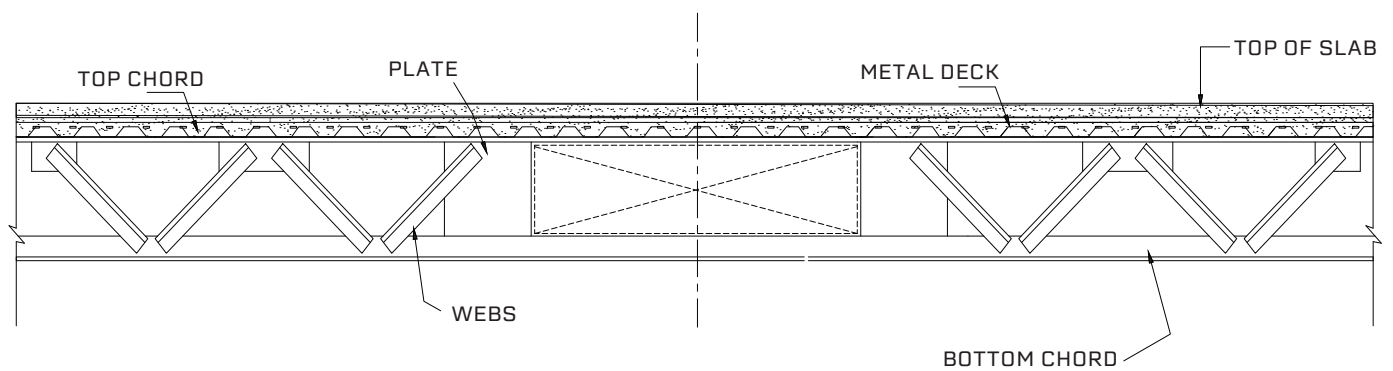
Typical Vescom Long Span (Girder) Vierendeel Opening
